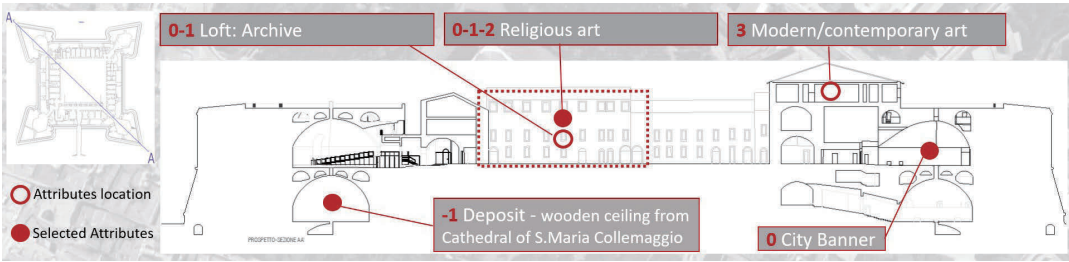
Cross section of the structure displaying the location of attributes within the building (Source: author. Technical drawings courtesy of Alessandra Tunno)
